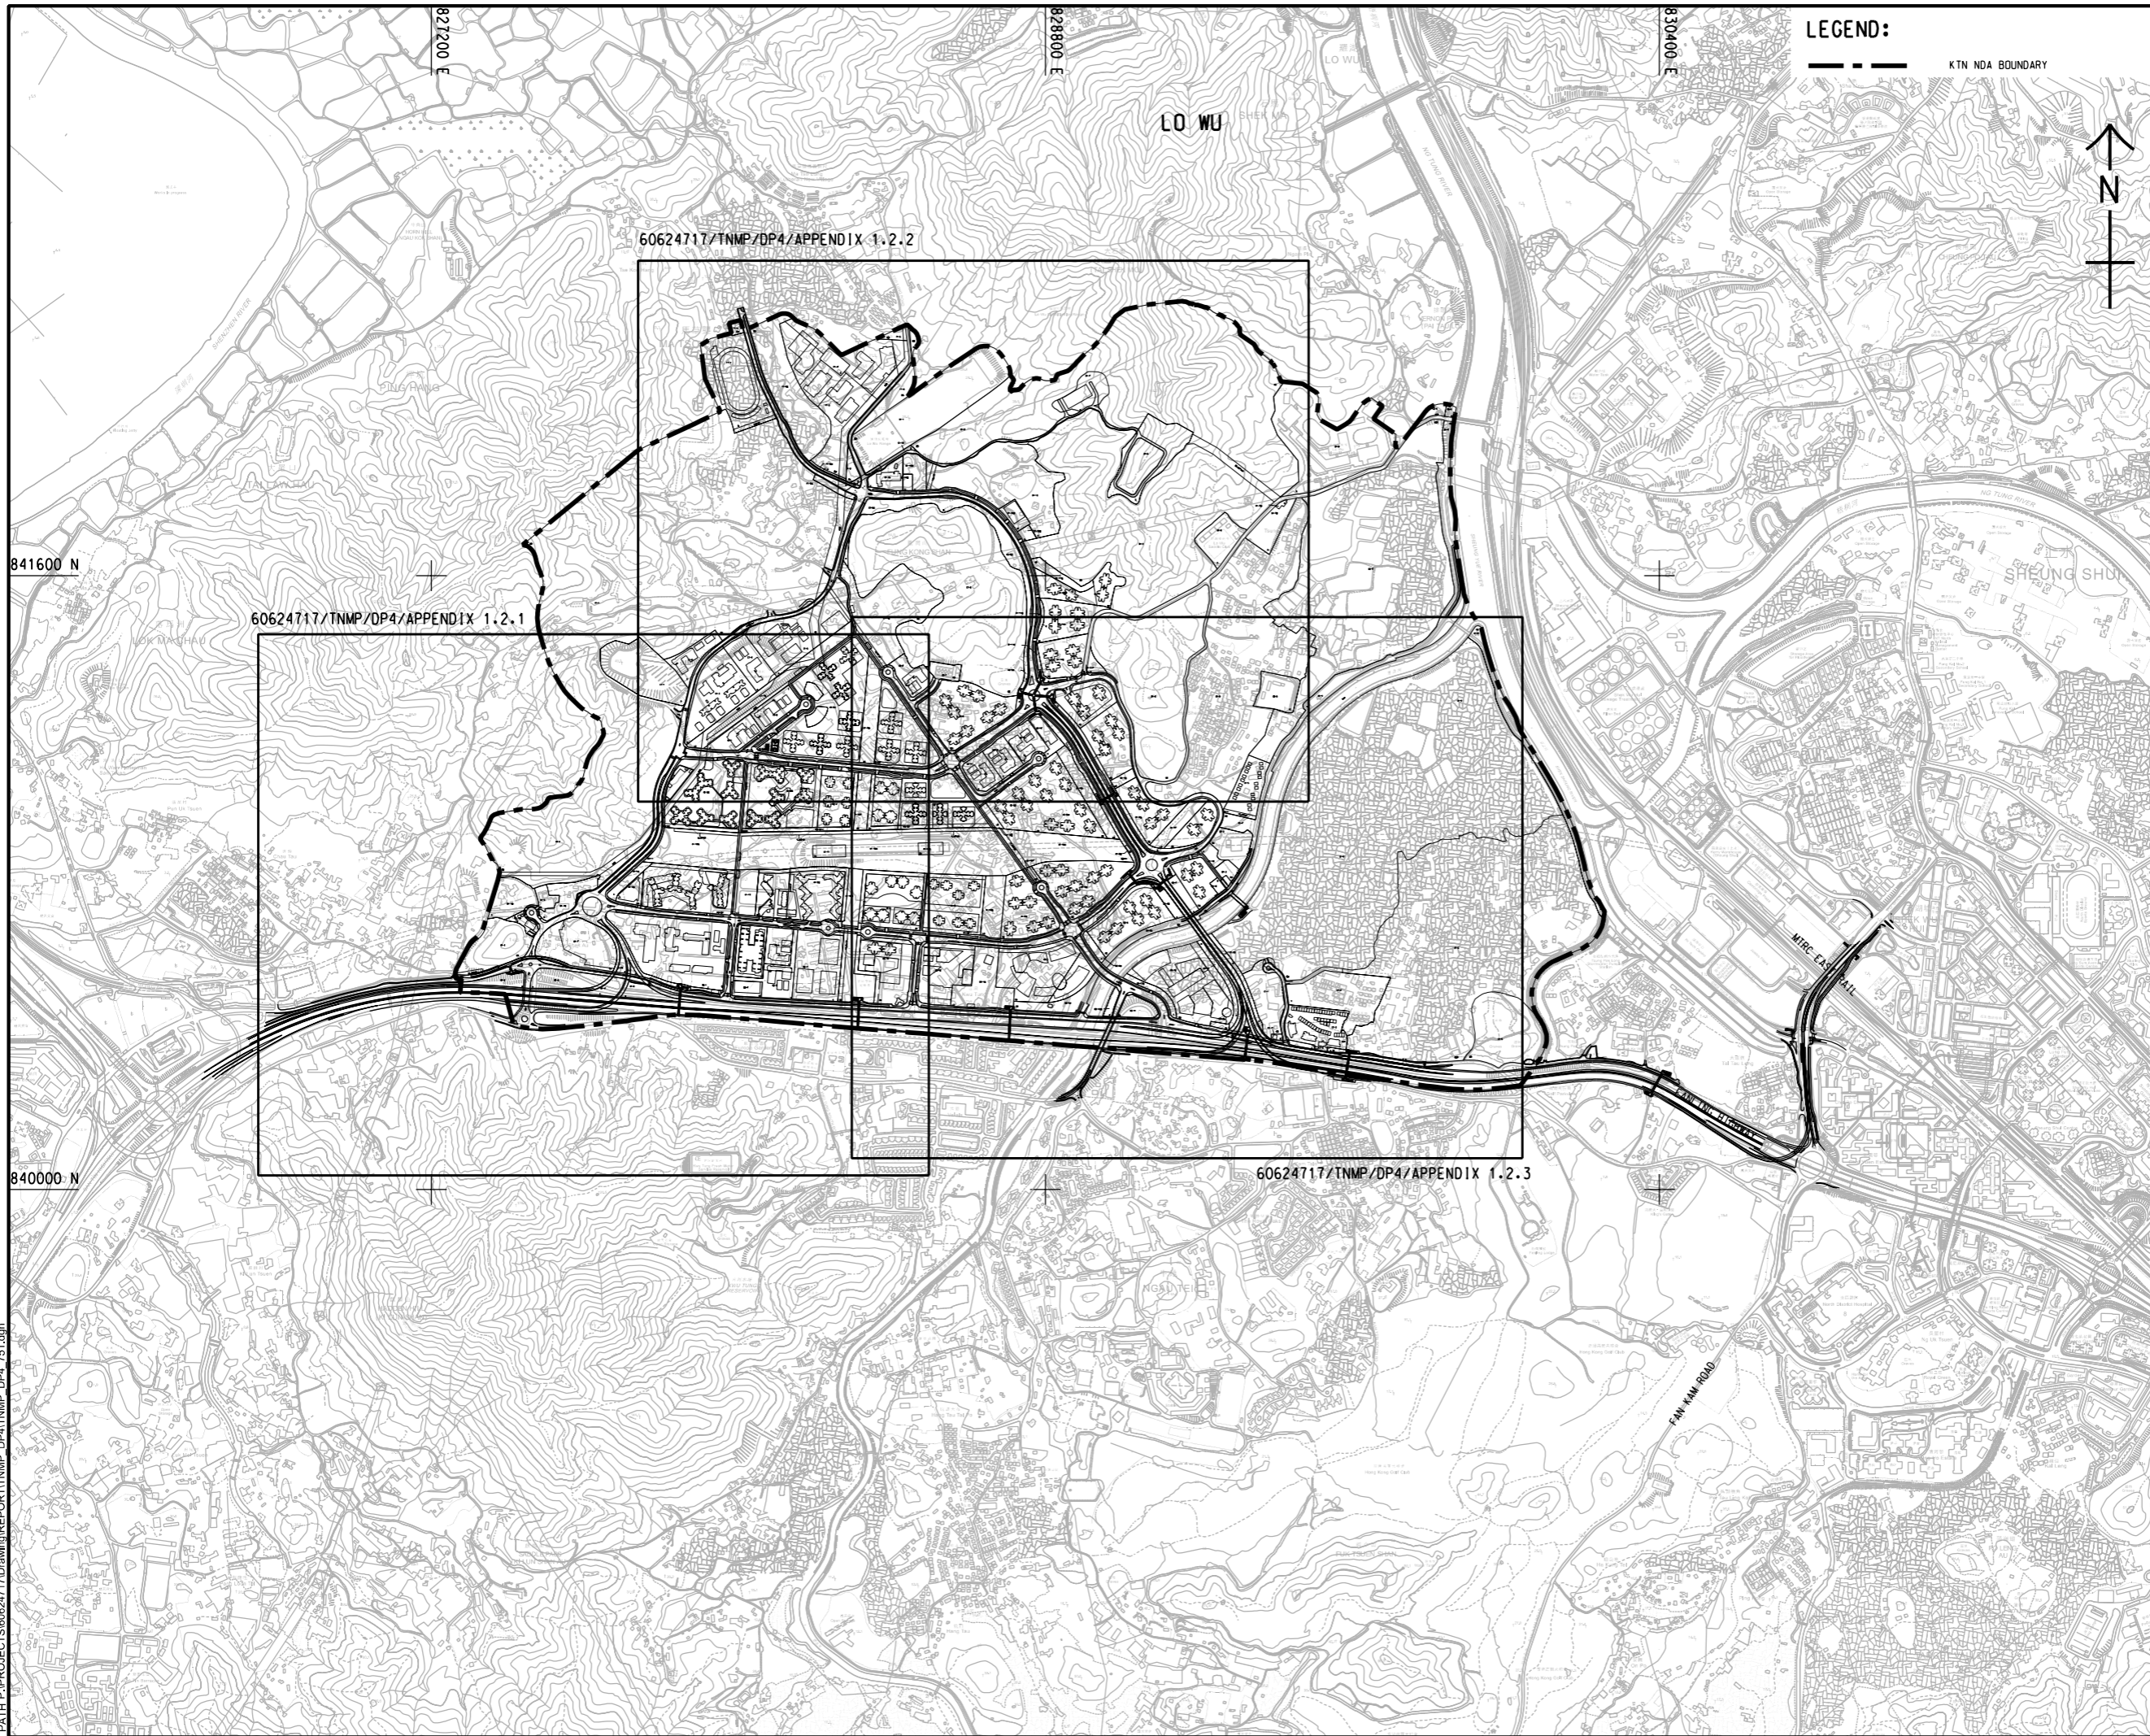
Locations of Non-Building Areas, Terraced Podiums, Ground Level Setback, Locations of Permeable Elements and Proposed Building Blocks within the Application Sites and Surroundings under the Proposed Scenario
